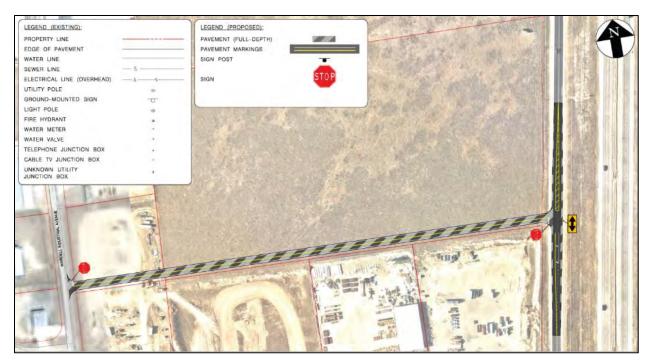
CONCEPT #5 - NEW LOCATION STREET CONNECTION TO SALT CREEK FOR TRUCK ACCESS
